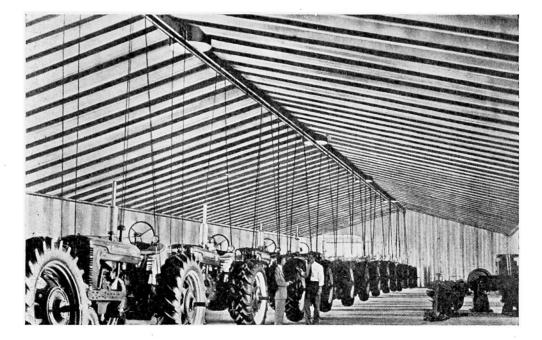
Frameless utility building, 50 ft. span, with tractors suspended from ridge member (average ridge load 320 lb./ft.) (Behlen Manuf. Co.)
